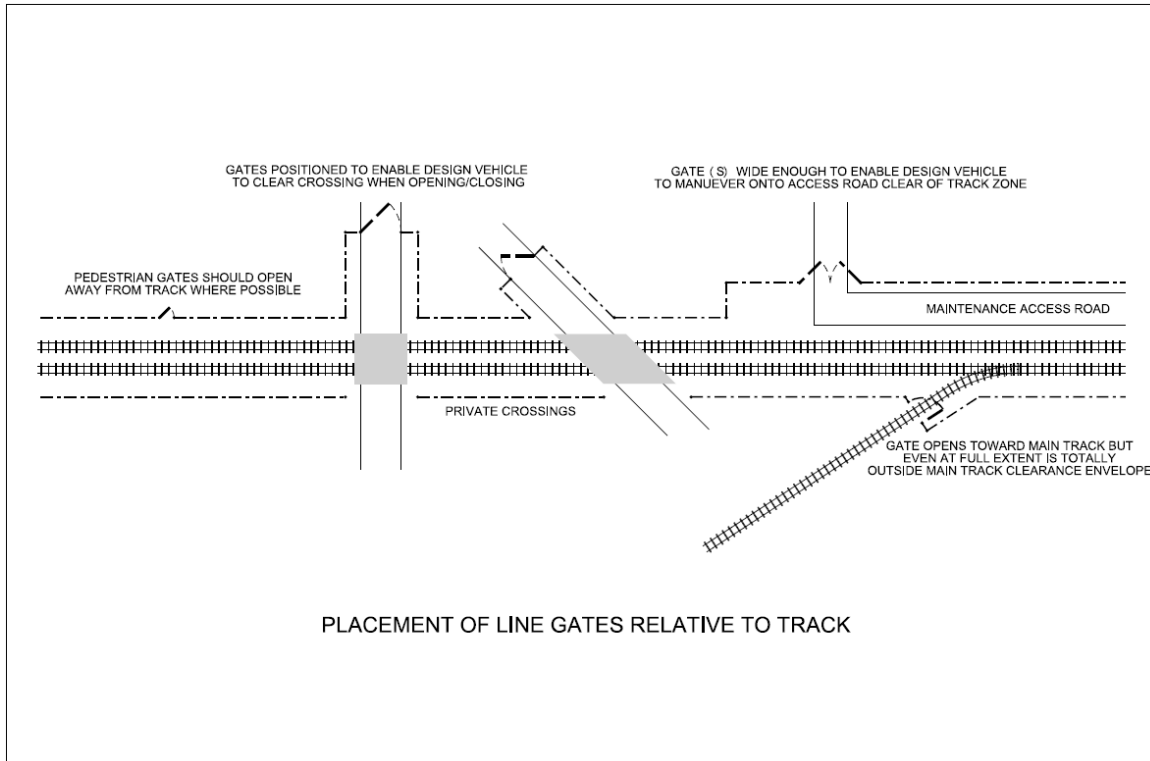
Arrangement of Line Gates within Track Zone.
